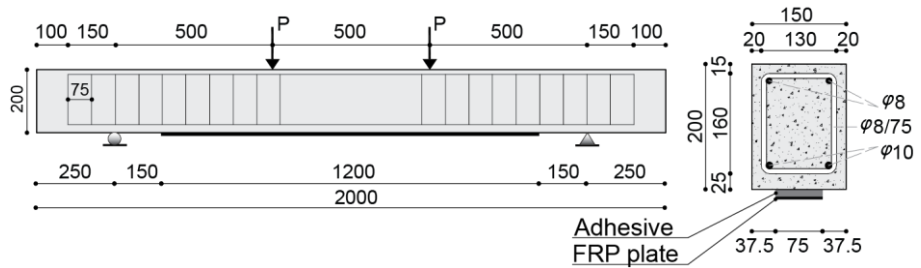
Geometric configuration, loading and boundary conditions of the tested FRP-plated RC beam (all dimensions are expressed in mm).
